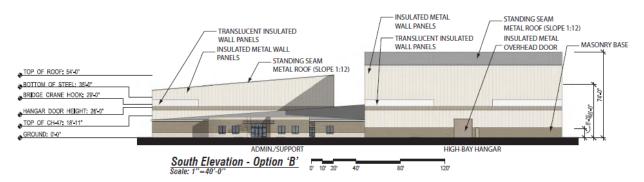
Building Features and South Elevation of the Proposed FAF (Facing Mat 3)
